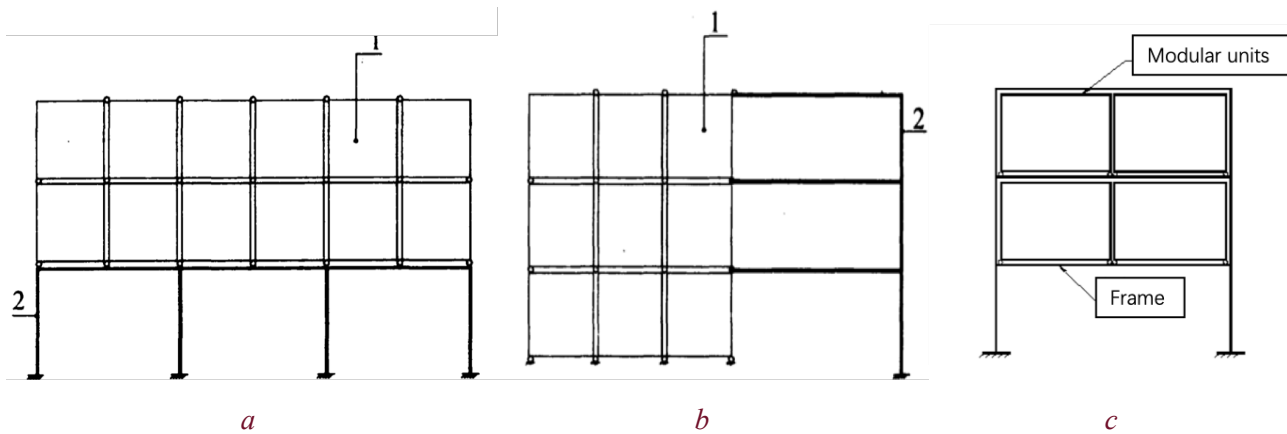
Module structure and frame composite system (from CECS 334: Technical Specification for modular freight container building). (a). Bottom frame and modular building composite system, (b). Support frame box frame system (c). Mega frame modular building structure system. 1 and 2 denote modular units and outer frame respectively.
